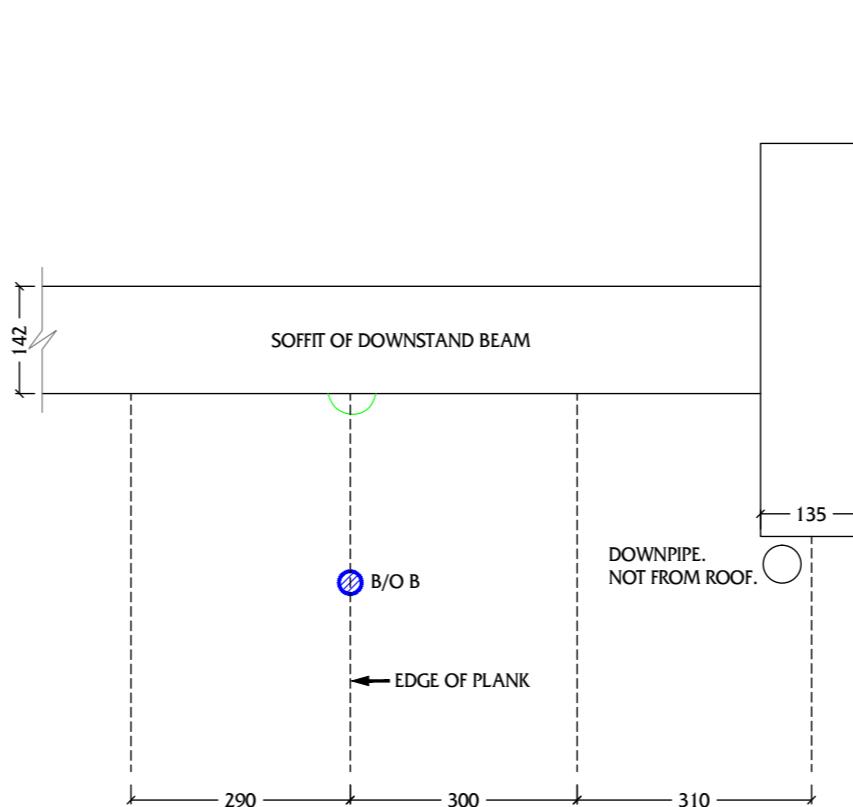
PART SECTION LOOKING EAST THROUGH ROOF SLAB SHOWING DETAILS OF PRECAST CONCRETE PLANK - SURVEY AREA RS2 SCALE 1:5
